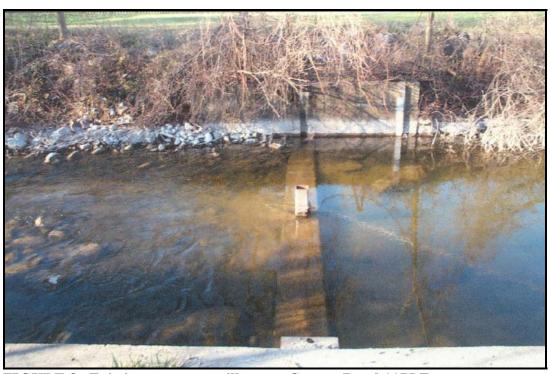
Existing concrete spillway at County Road 1175 East.
